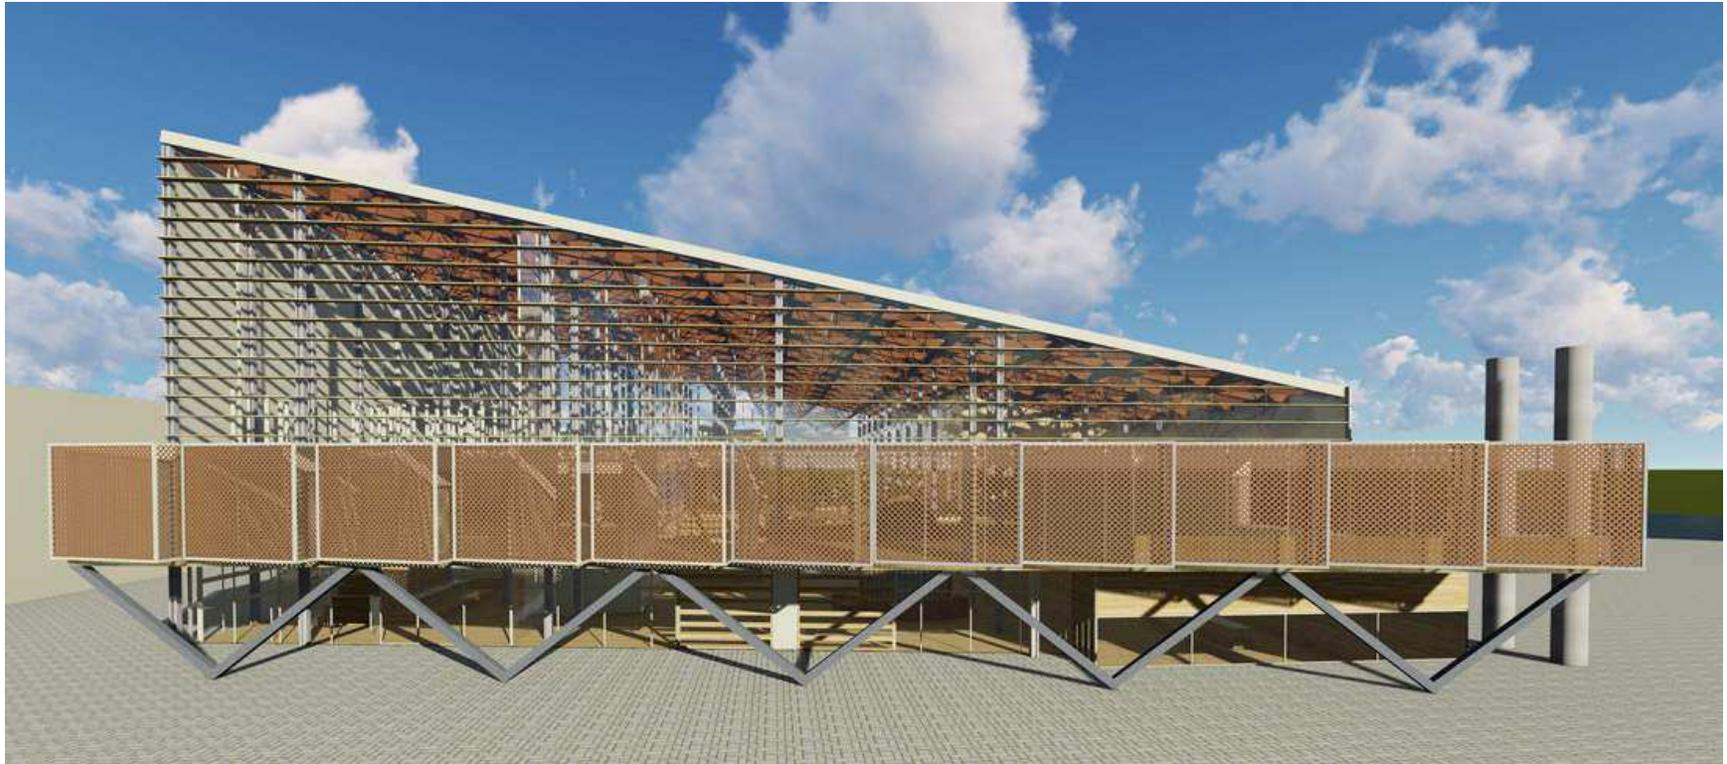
Exterior View from Johnston Street (Main Entrance View)
